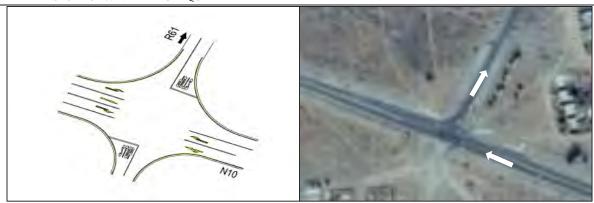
Geometric layout and aerial view of the N10/R61 intersection
